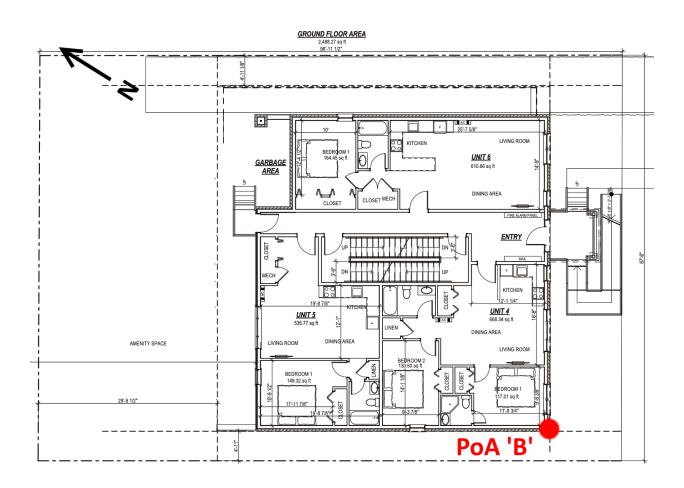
Ground Floor Plan, with Location of PoA 'B'
